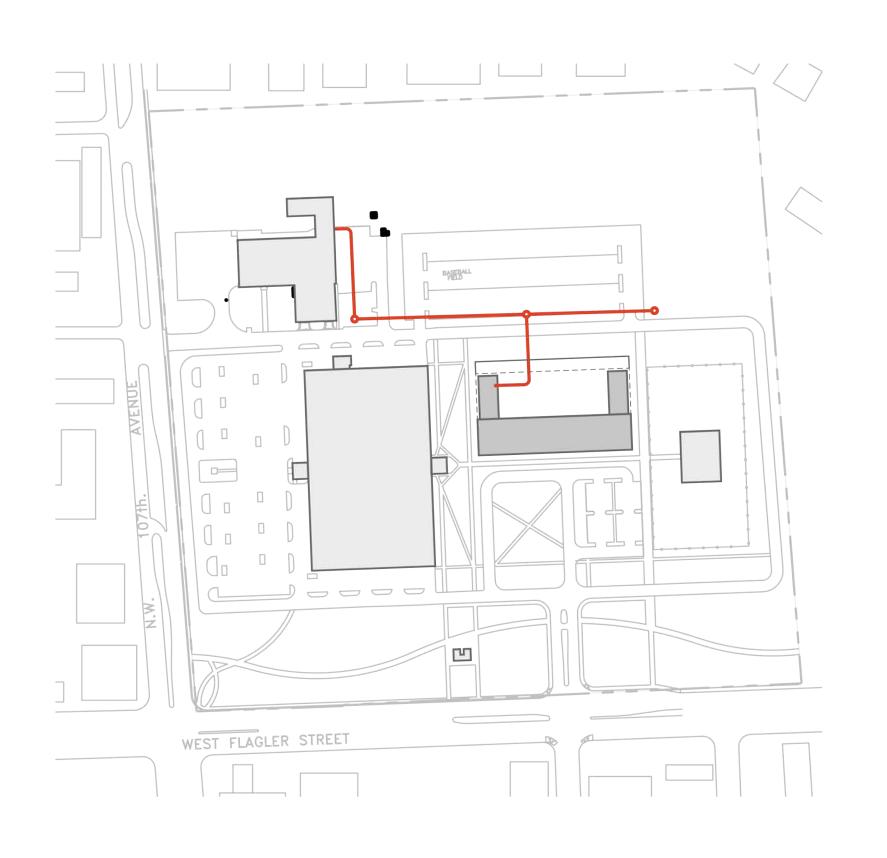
ENGINEERING CAMPUS 2015 CHILLED WATER INFRASTRUCTURE PLAN
